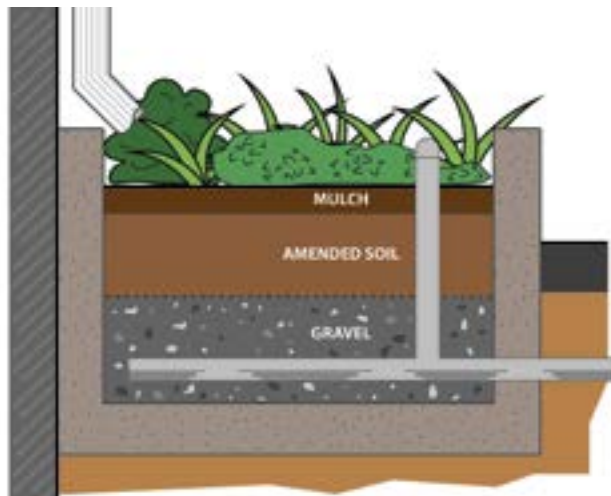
Schematic of Planter Box with Down Spout Connection and Underdrain
